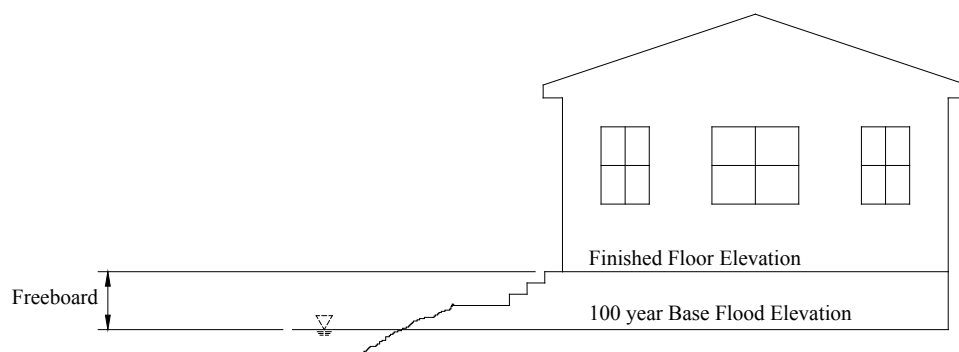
Riverine Area Finished Floor Elevation relative to the Base Flood Elevation.
